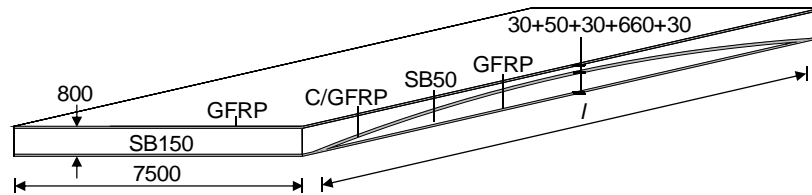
Sandwich bridge concepts for S-C/S-G slabs (dimensions in mm)
